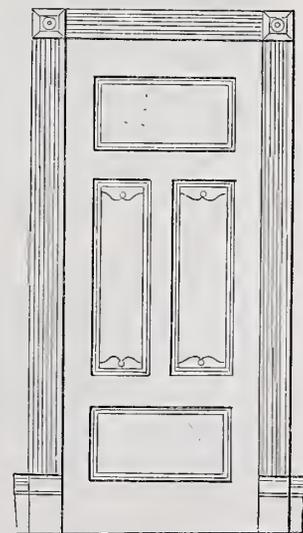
Elevation of Doors in Second Story.—Scale, 3/8 Inch to the Foot.
